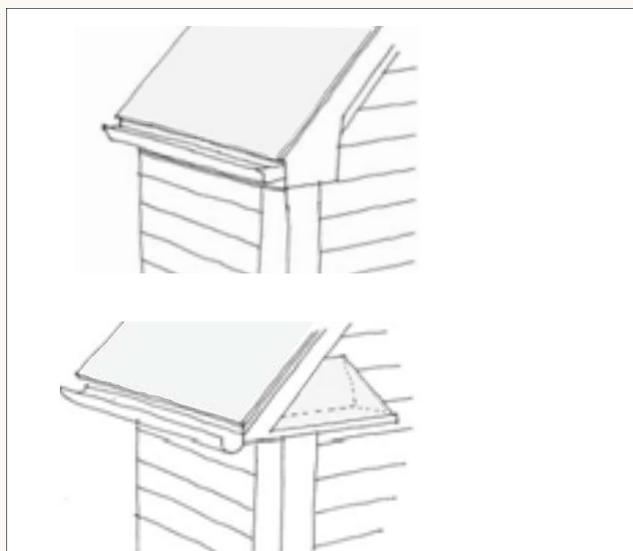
DON'T DO: Detail of eave return and eave finish errors
